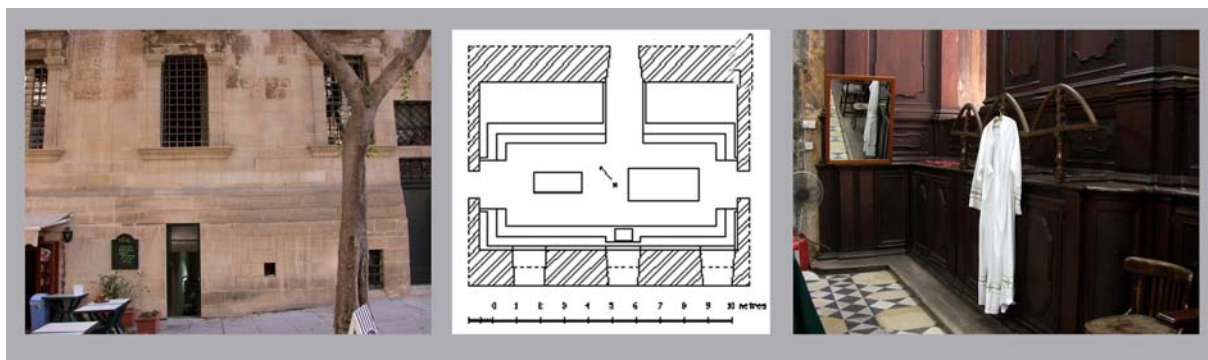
St John's Conventual Church, Valletta. Façade (left), plan (centre) and furniture (right) [3]
